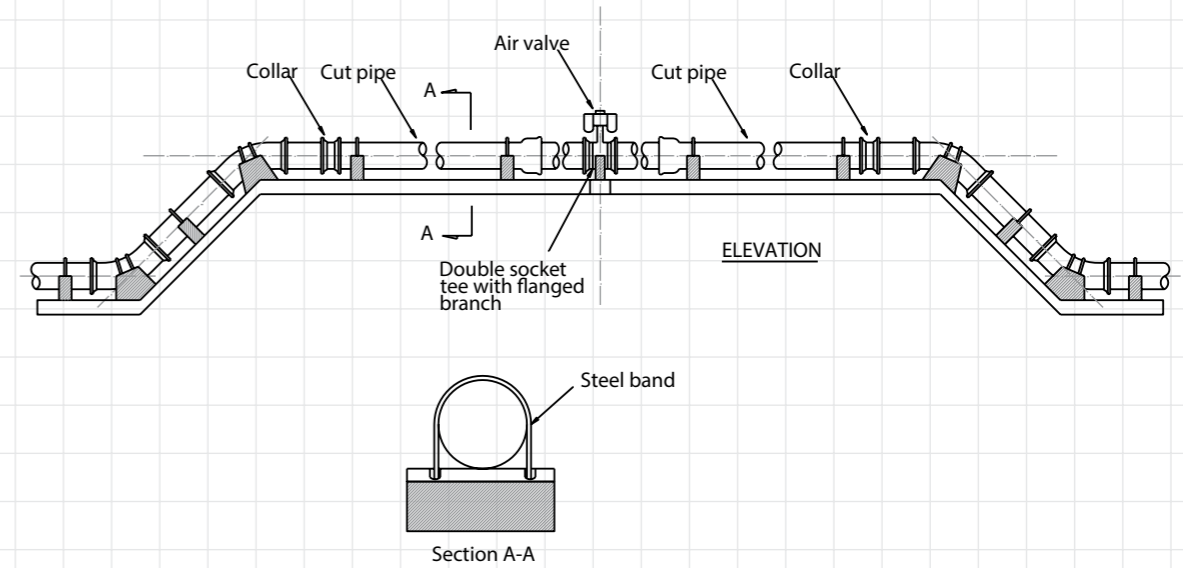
Overground pipe support arrangement for DI pipes.
